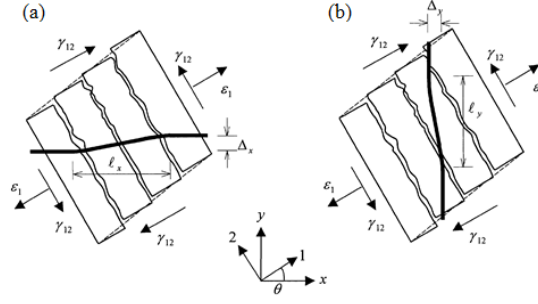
Cracked Concrete Elements Containing a Reinforcement Bar Running (a) in the x-direction and (b) in the y-direction Crossing the Cracks at Acute Angle (He and Kwan, 2001).
